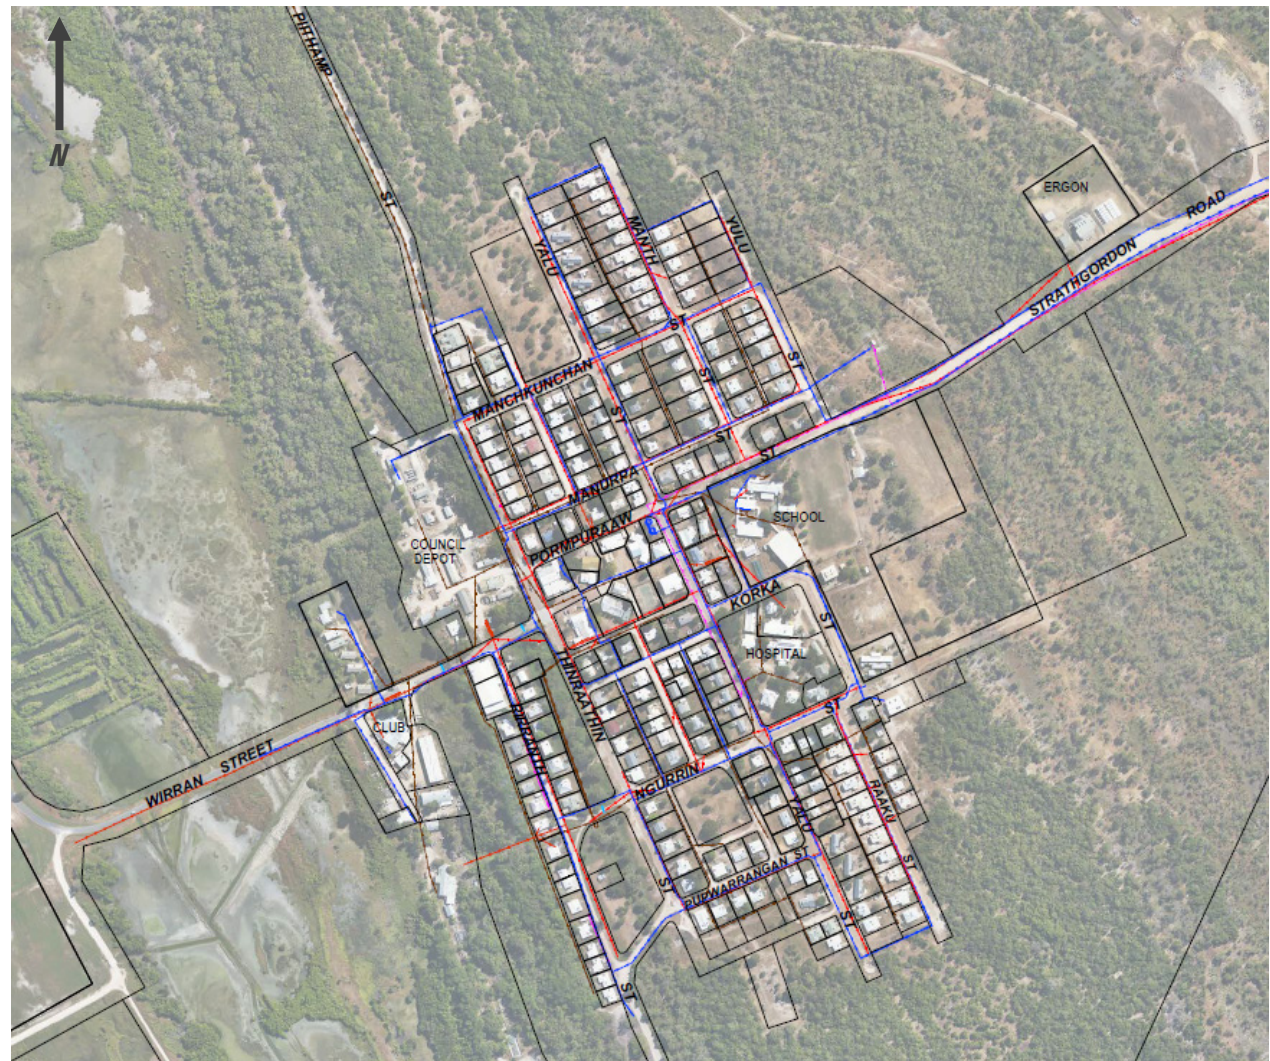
Pormpuraaw township reticulated infrastructure (as constructed)
